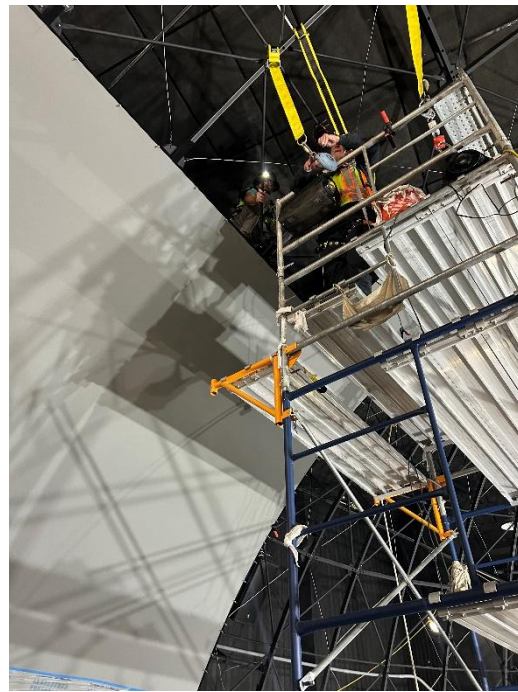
Workers tied off to the dome steel structure. SRLs were hanging too low. Multiple anchorage straps connected to the same steel section.
